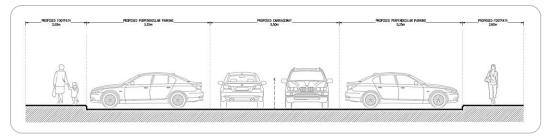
Typical two-way local street cross section (Racecourse Grove)
